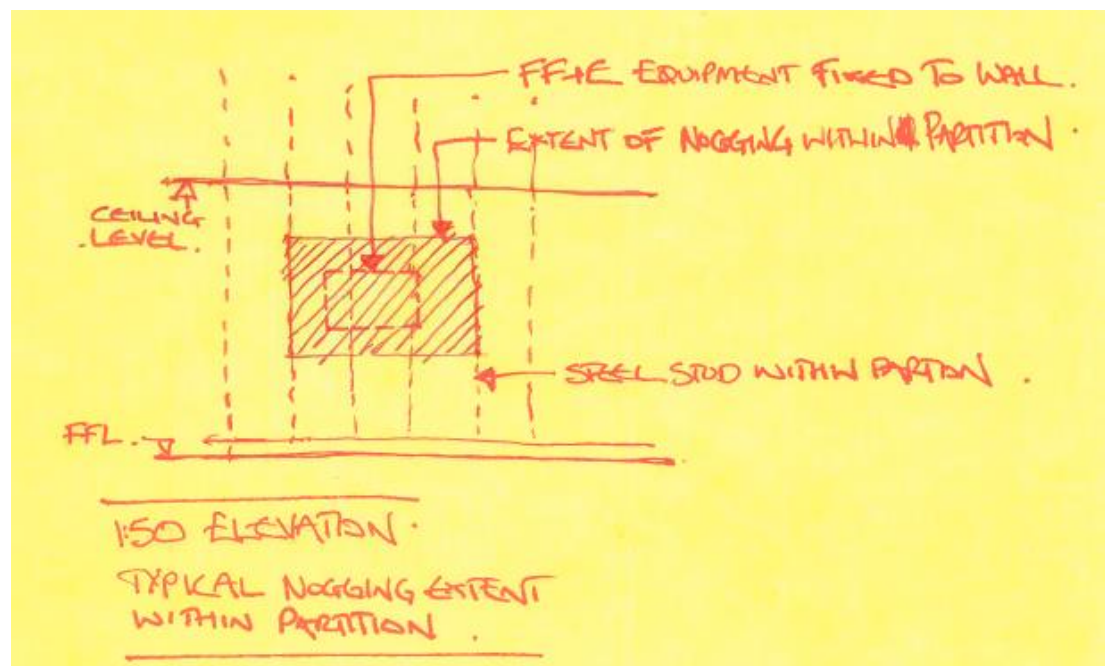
Elevation view of smoke wall (plywood timber nogging within wall shown as hatched area)
